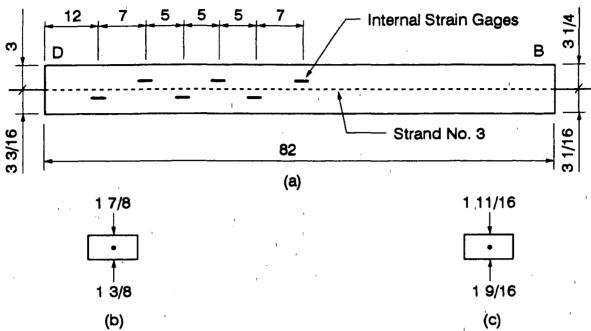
Specimen No. 11-3.0TU-7 (dimensions shown in inches):
